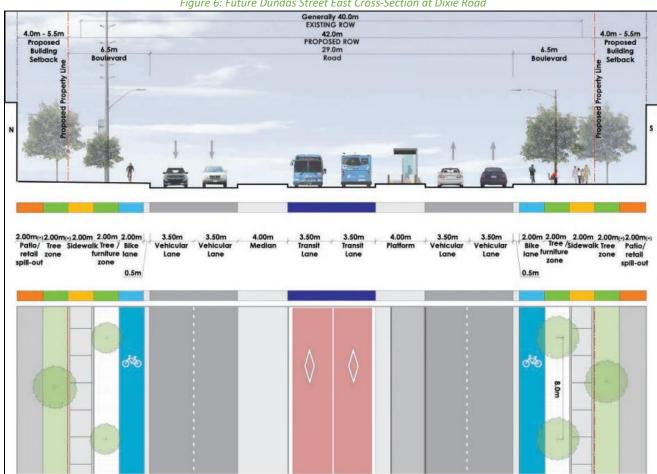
Future Dundas Street East Cross-Section at Dixie Road
